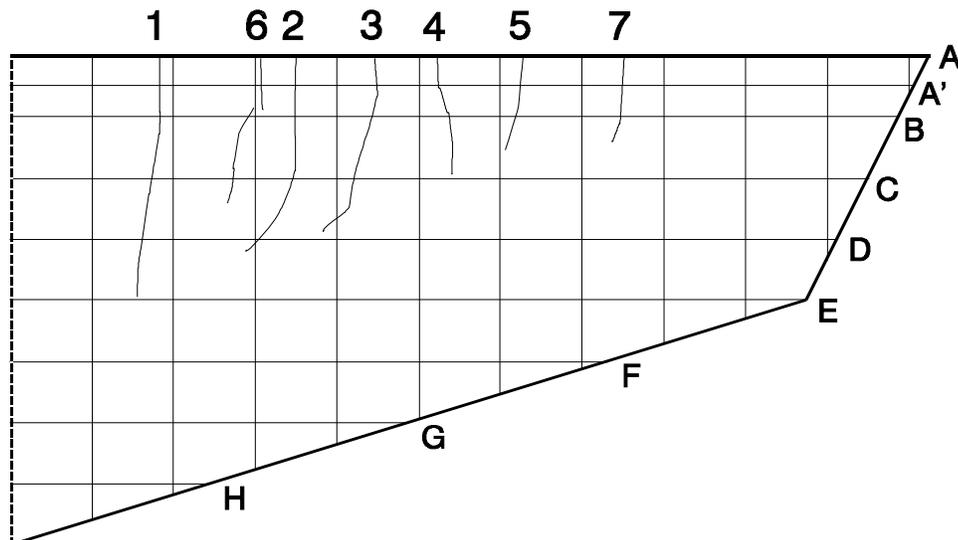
POJ-RC-100-TH cracking pattern on north face of overhang at service load
